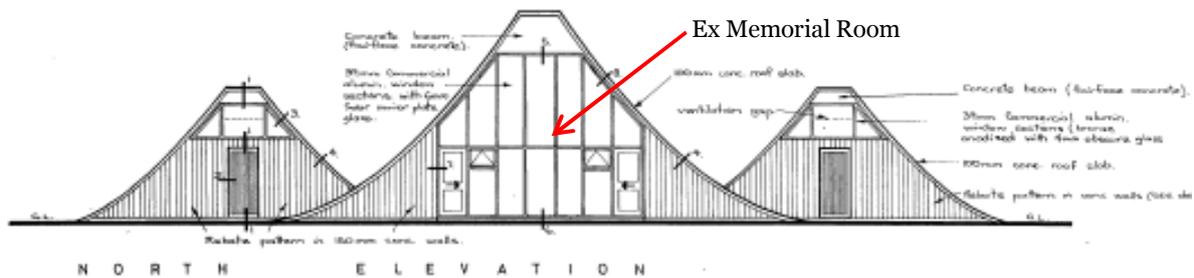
North elevation of the Ex Memorial Room and public toilets.
